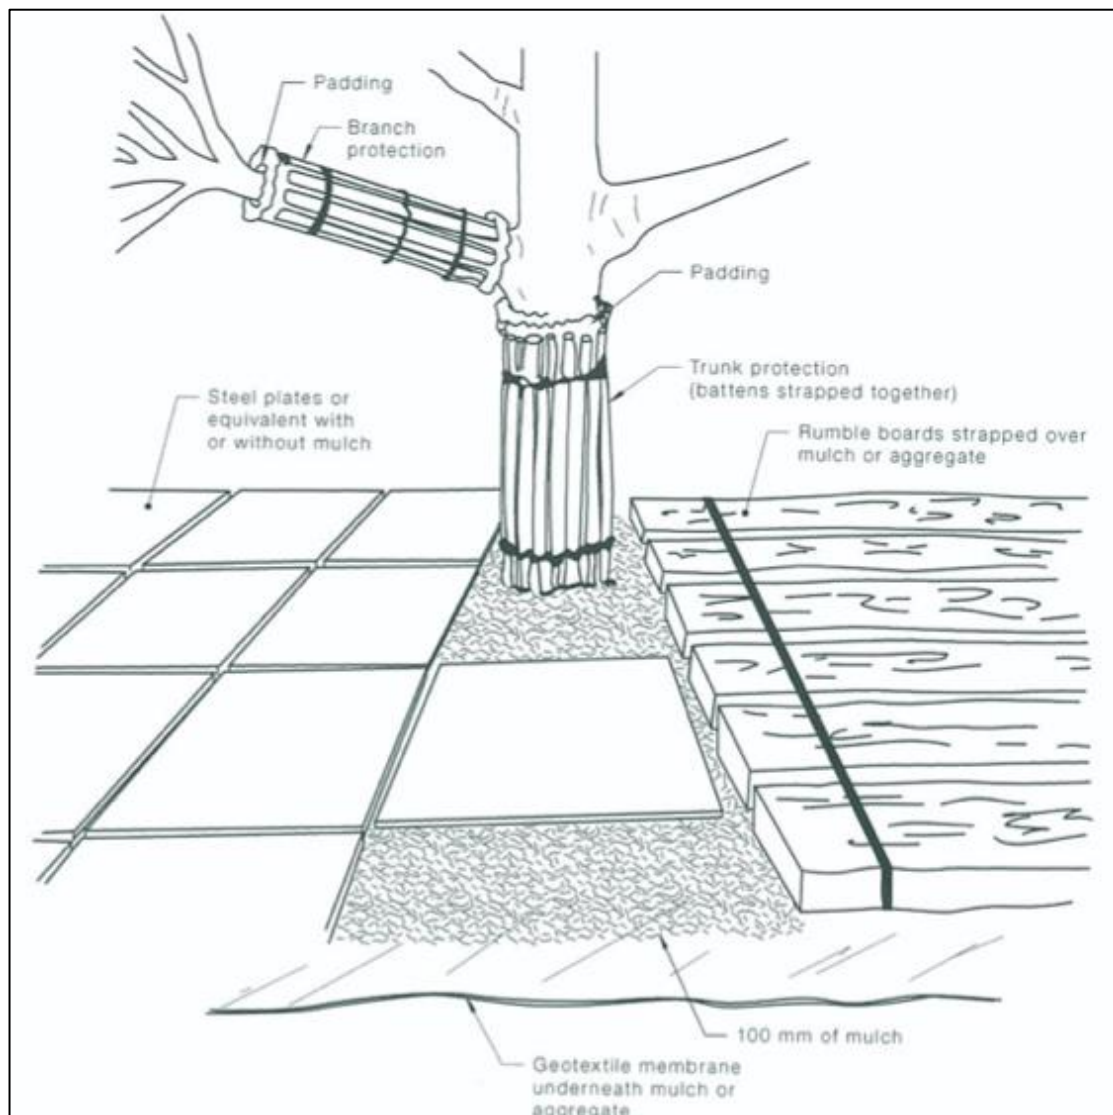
Ground protection measures specified in Section 4.5.3 of *AS4970 (2009)* for temporary access within a fenced protection zone. Steel plates or rumble boards are shown to be suitable for ground protection over mulch and geotextile fabric.
